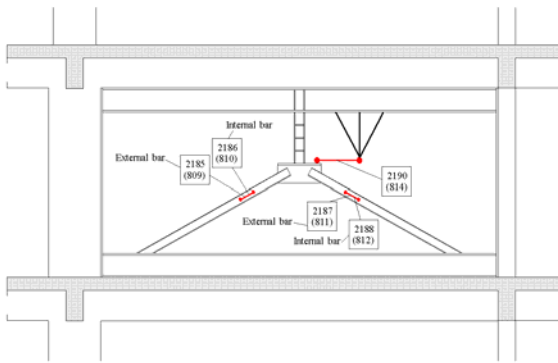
K-bracing test instrumentation: bracing and shear-link instrumentation
